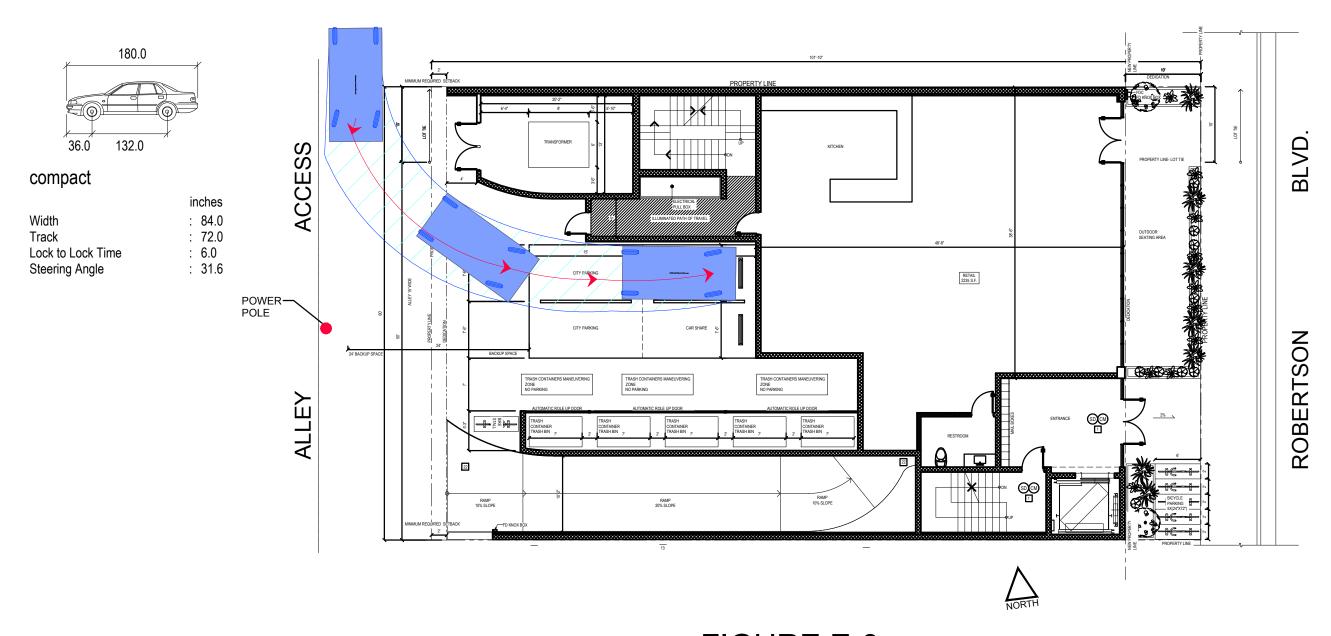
FIRST FLOOR NORTHEAST CORNER PARKING SPACE ACCESS SWEPT PATH
